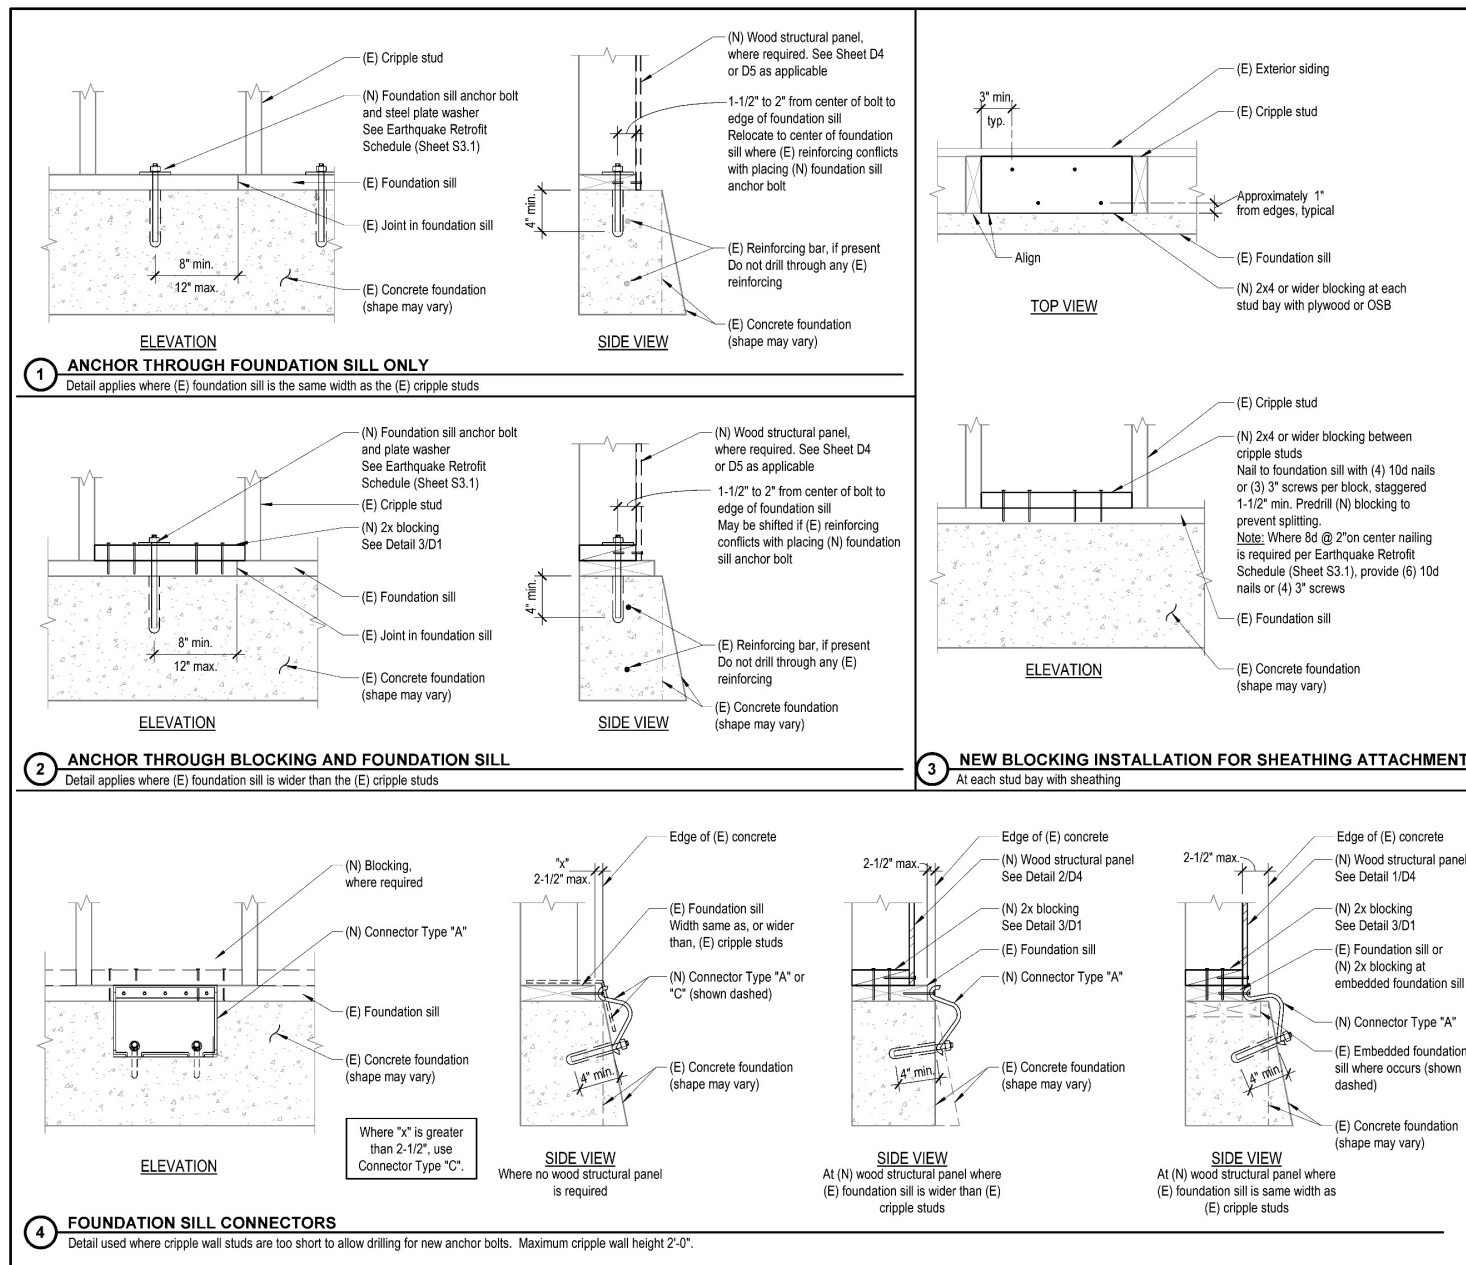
Foundation sill to concrete foundation connection details. Sheet D1.
